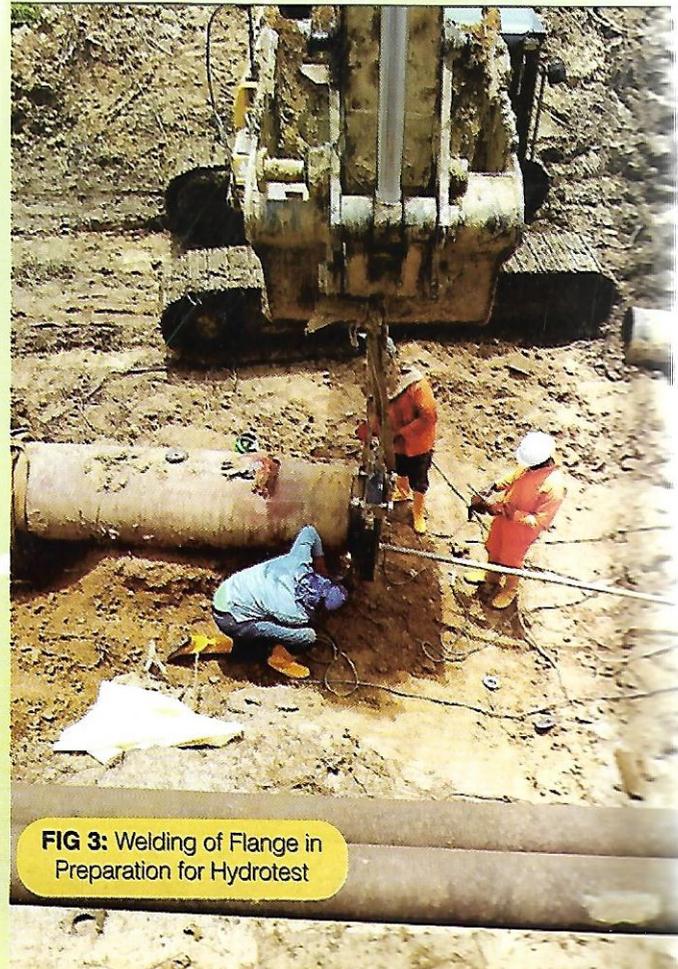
Welding of Flange in Preparation for Hydrotest
